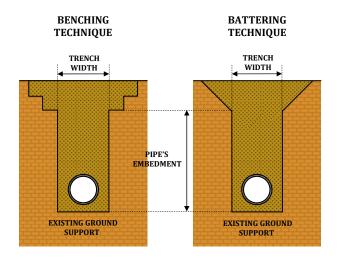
Benching and battering techniques used for deep-trench excavations
